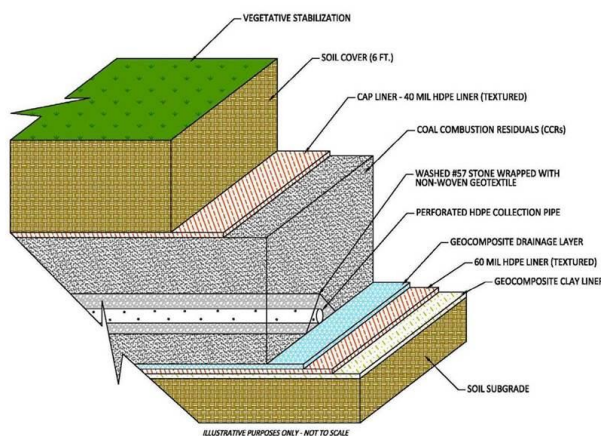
Fully-lined Engineered Structural Fill (Charah)
